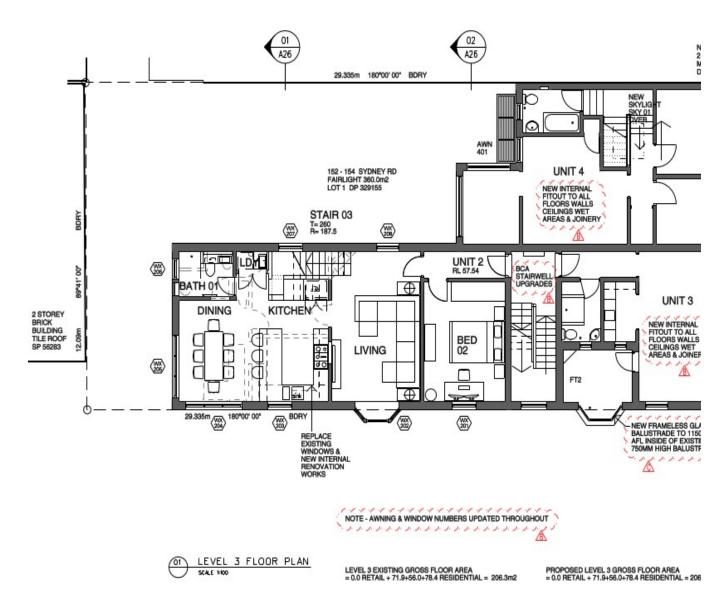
Proposed Level 3 Floor Plan (Unchanged)
